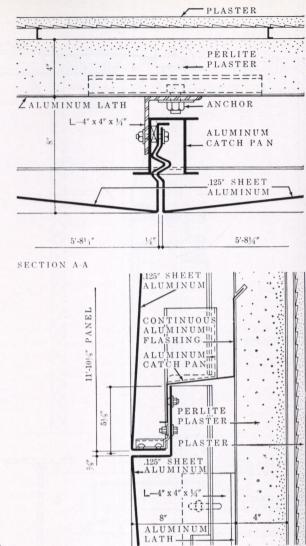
Aluminum sheet clad skyscraper. See additional details on Page 293.
